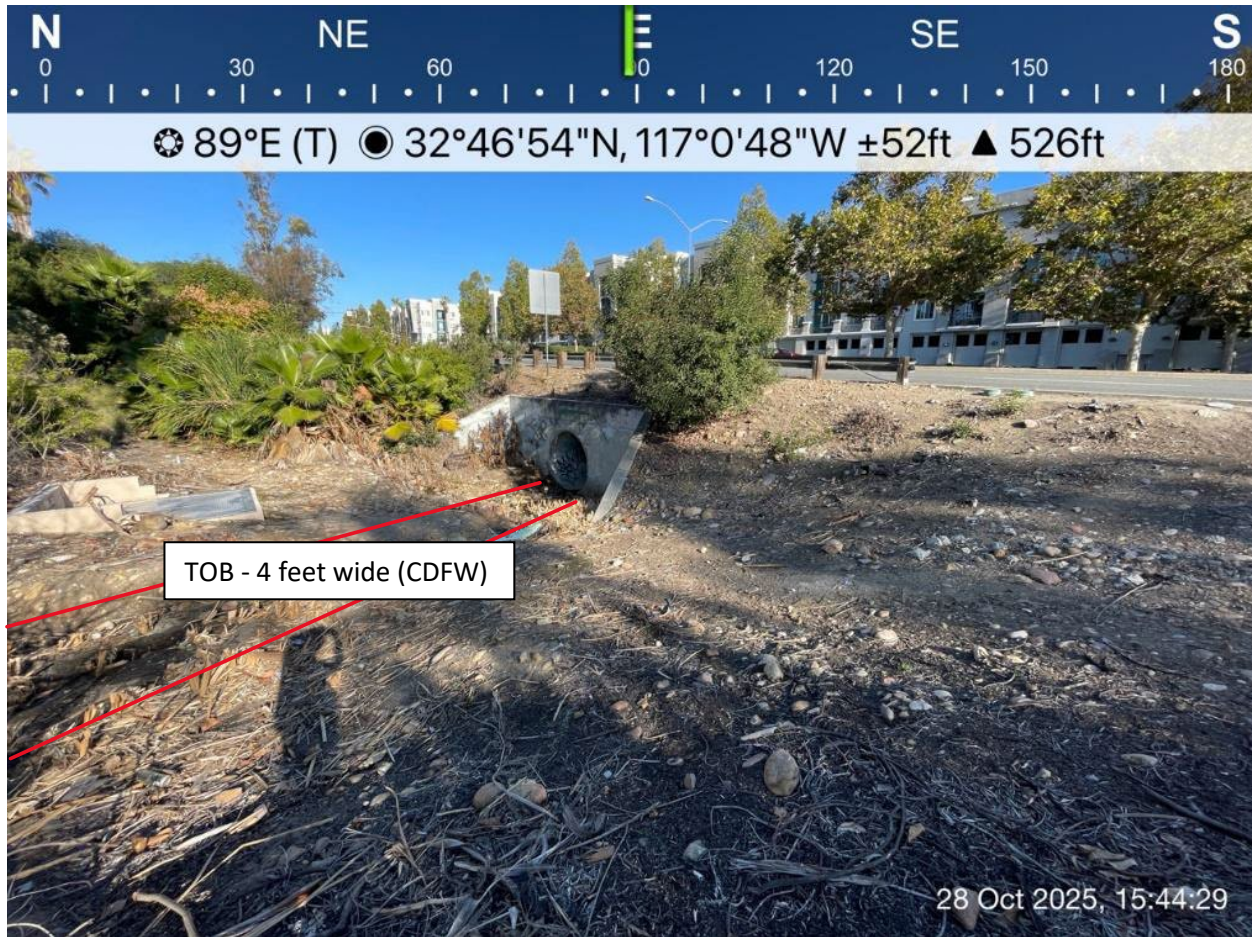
Work Location 555+79 and NWW-ALT-07, an intermittent channel providing stormwater drainage from Parkway Drive toward Fletcher Parkway. View toward Fletcher Parkway of the headwall for culvert associated with features NWW-ALT-06 and -07 (Photo 13); facing east. October 28, 2025.
